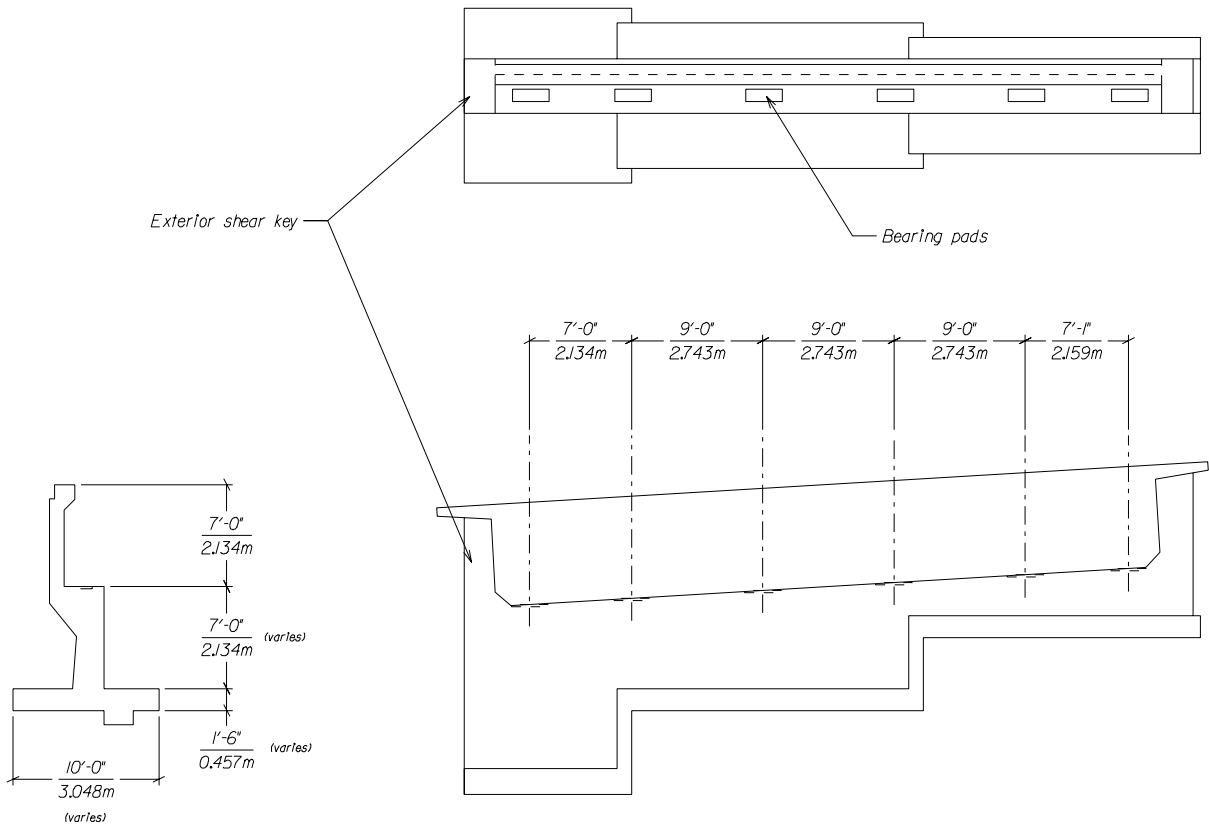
Plan and Elevation of Seat-Type Abutment
